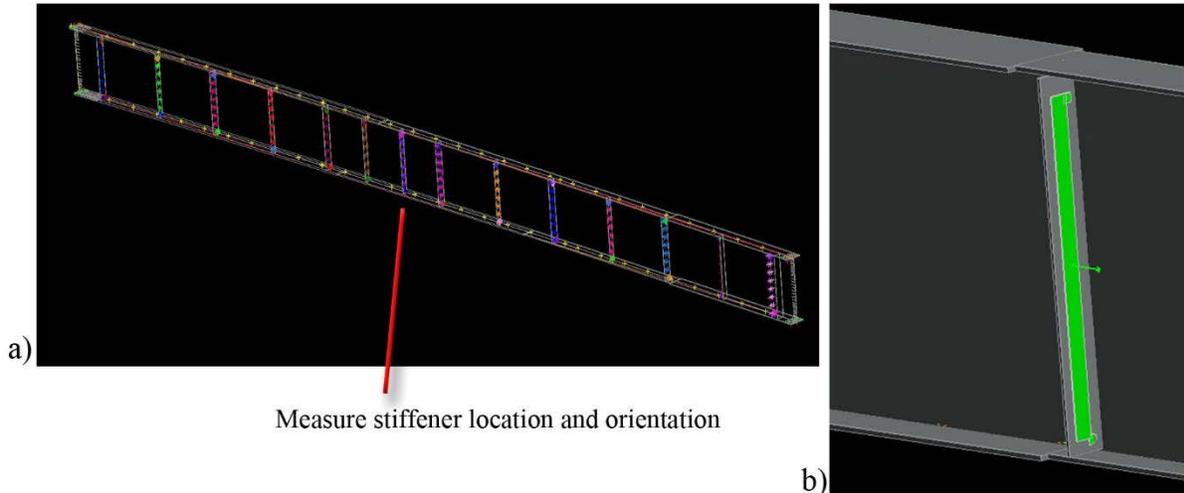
Measurement of Girder Stiffener Location and Orientation Showing a) Multiple Stiffeners Along Length of Girder and b) Close-Up of Stiffener Measurement (Green) Overlaid on Ideal 3D CAD Model
